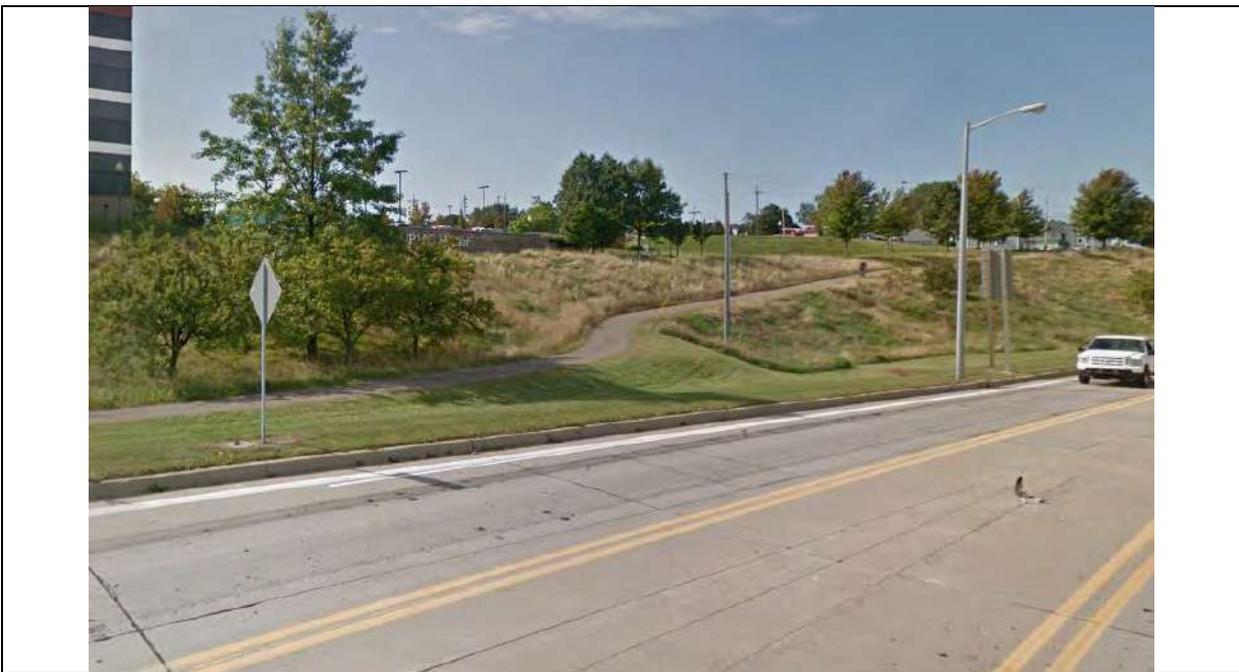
of Bayfront Promenade Trail looking west from Bayfront Parkway.
